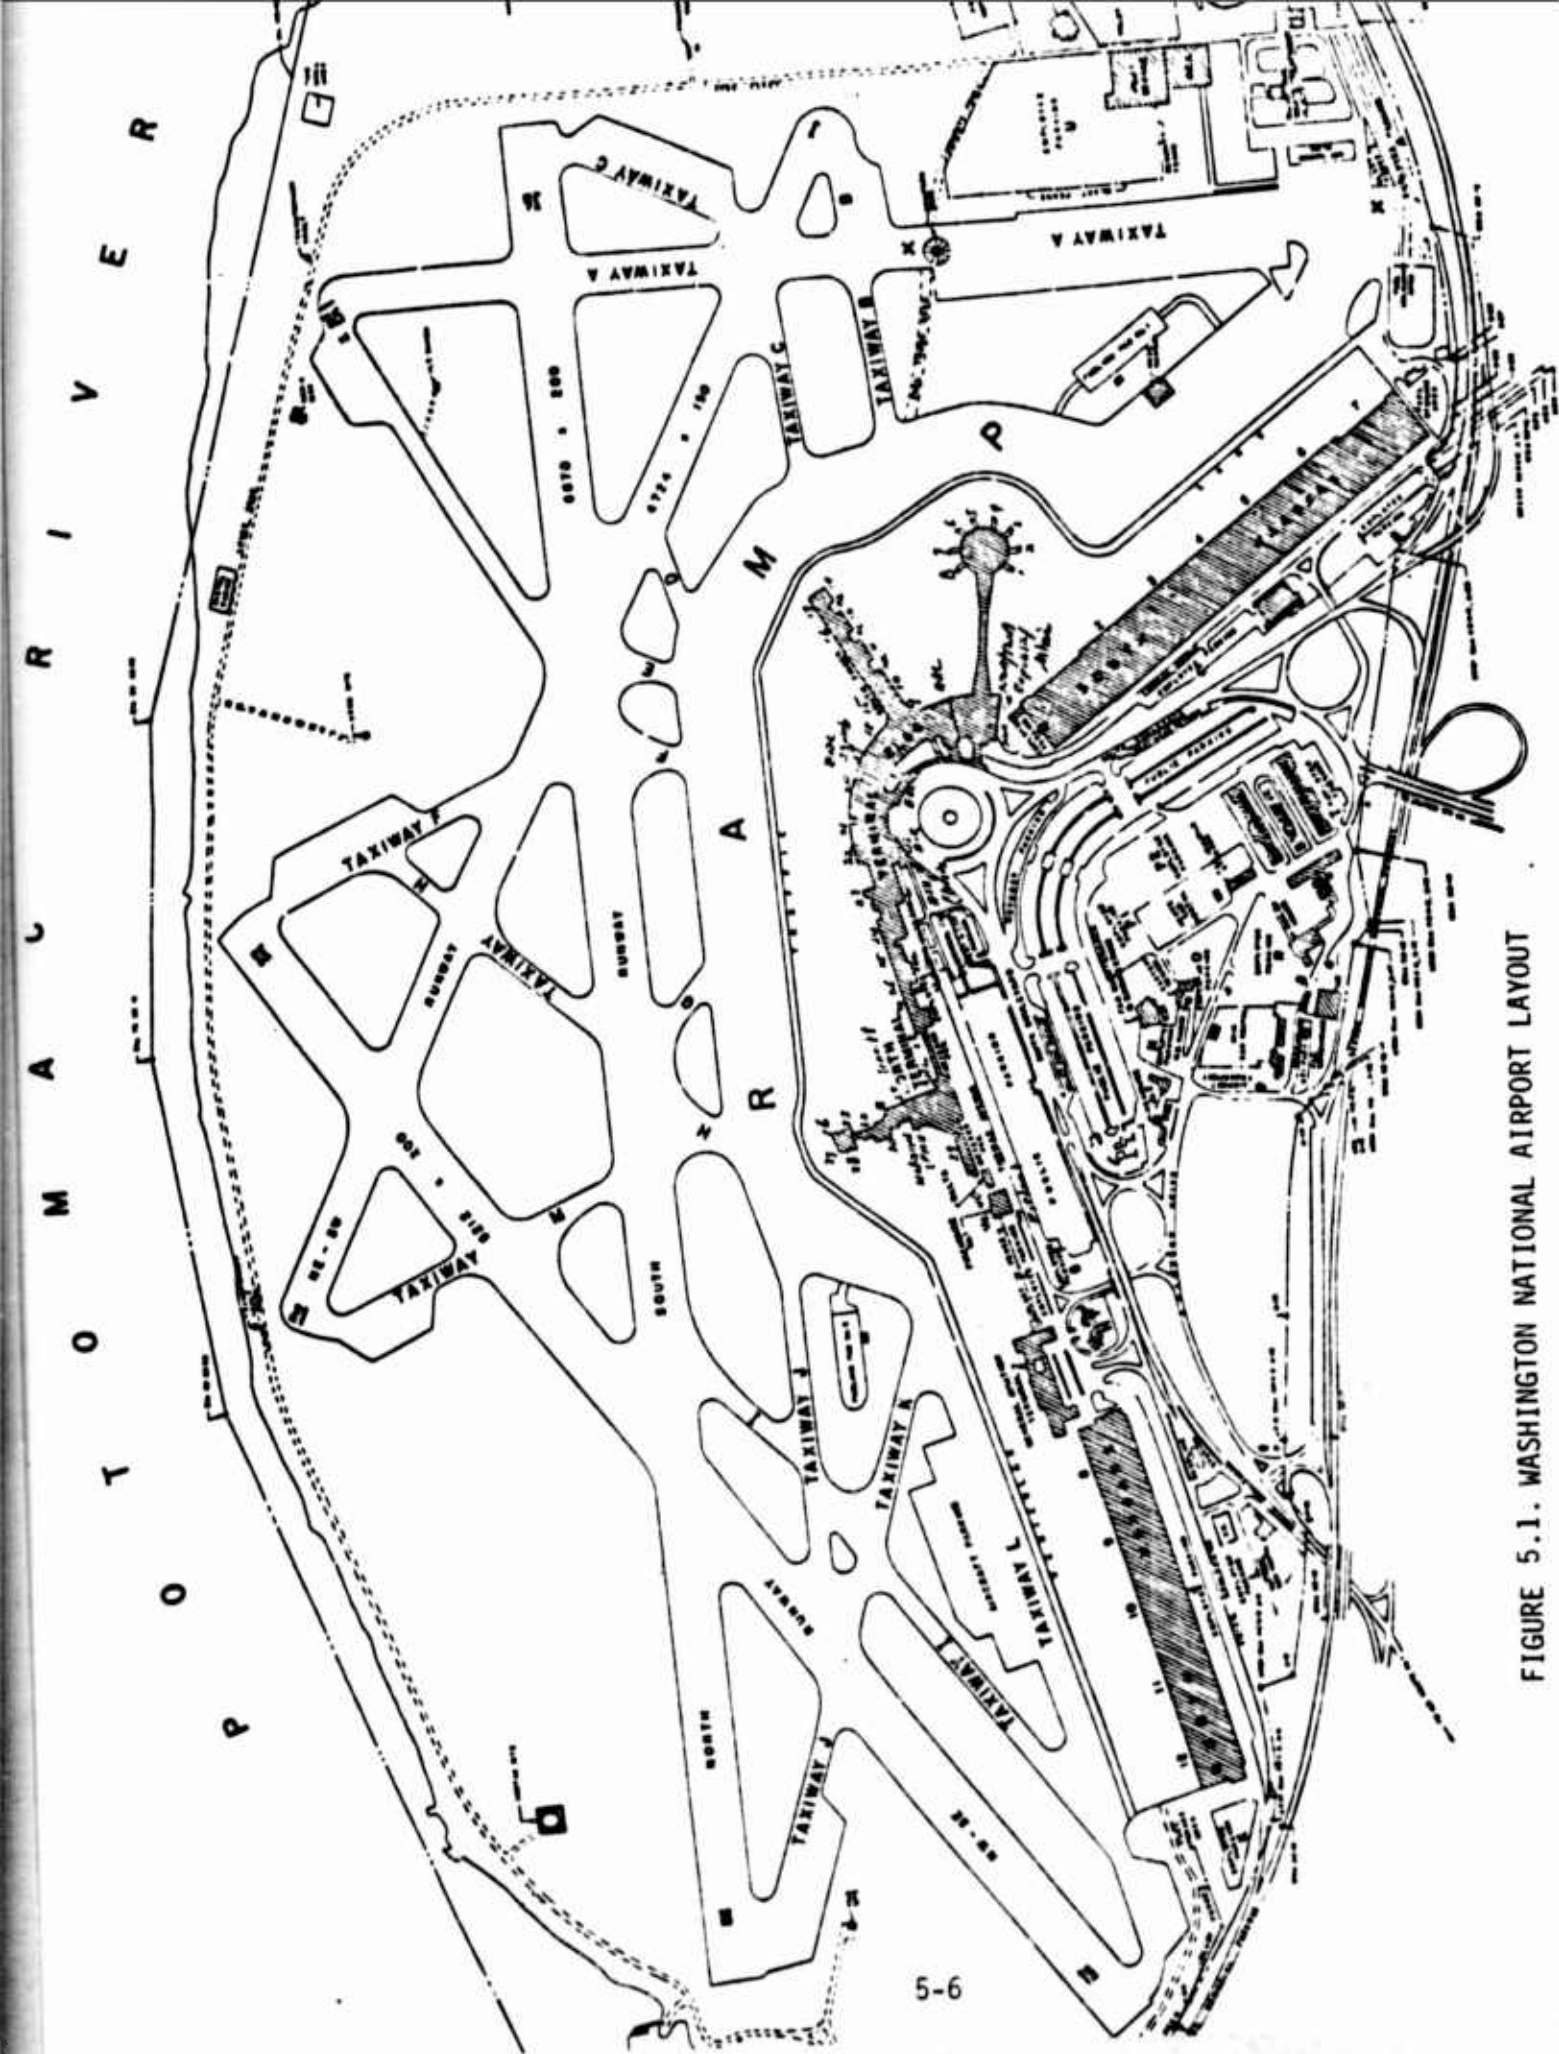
WASHINGTON NATIONAL AIRPORT LAYOUT
